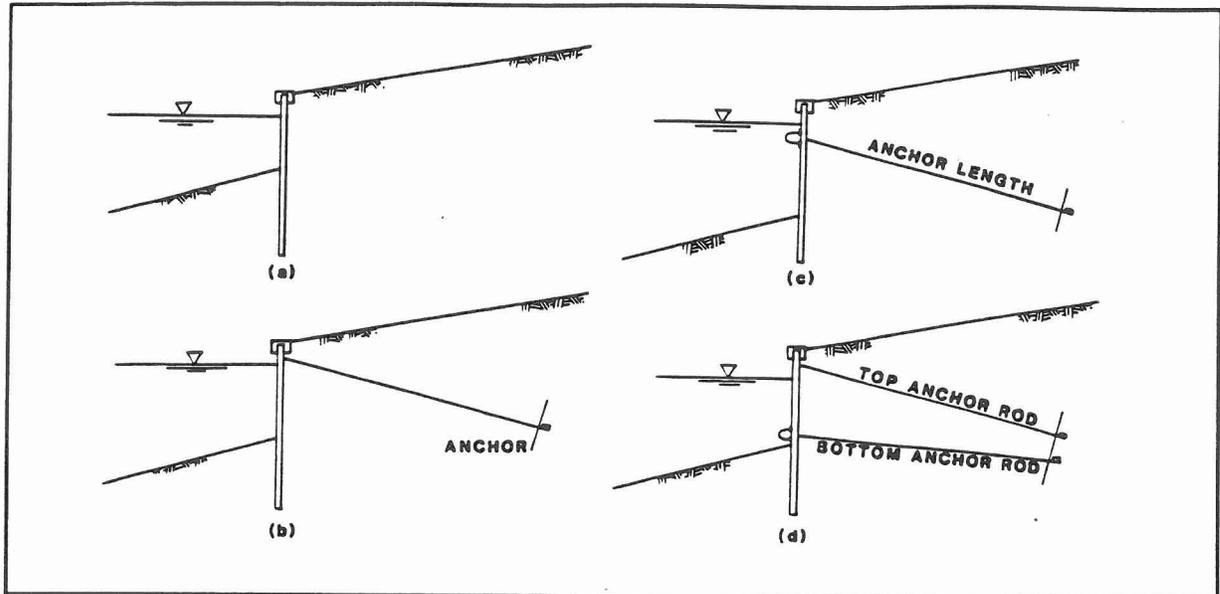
Anchorage schemes for a sheetpile bulkhead (After [37]).
